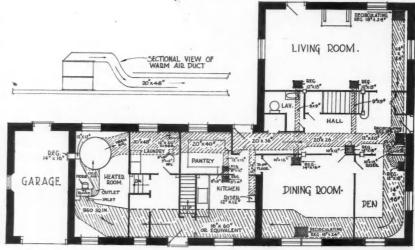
First Floor Plan of a 15-Room, Basementless Residence Which Was Successfully Heated with a Warm Air Furnace. In this plan the warm air ducts are fully indicated.
